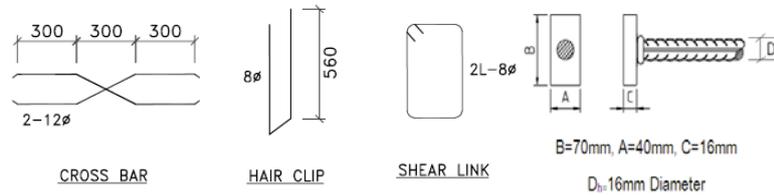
Joint reinforcement bar and welded T-type headed bar
